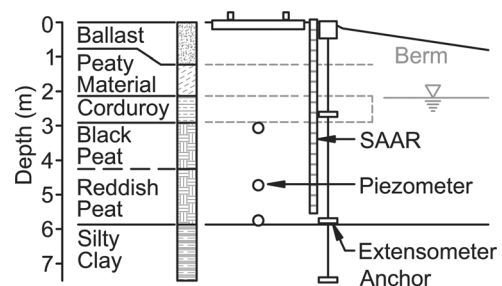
Cross section of embankment and foundation at Mile 102.0. Location and depths of the instrumentation are shown.
